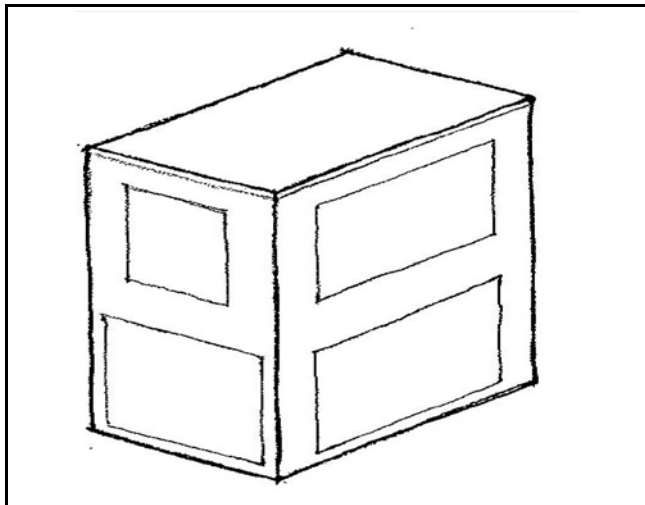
This building has a flat roof, giving it a different form. Being generally the same size however, it can be said to have a similar *mass* to the building illustrated in the preceding diagram (but the pitched roof elements predominant in the zones are absent).
